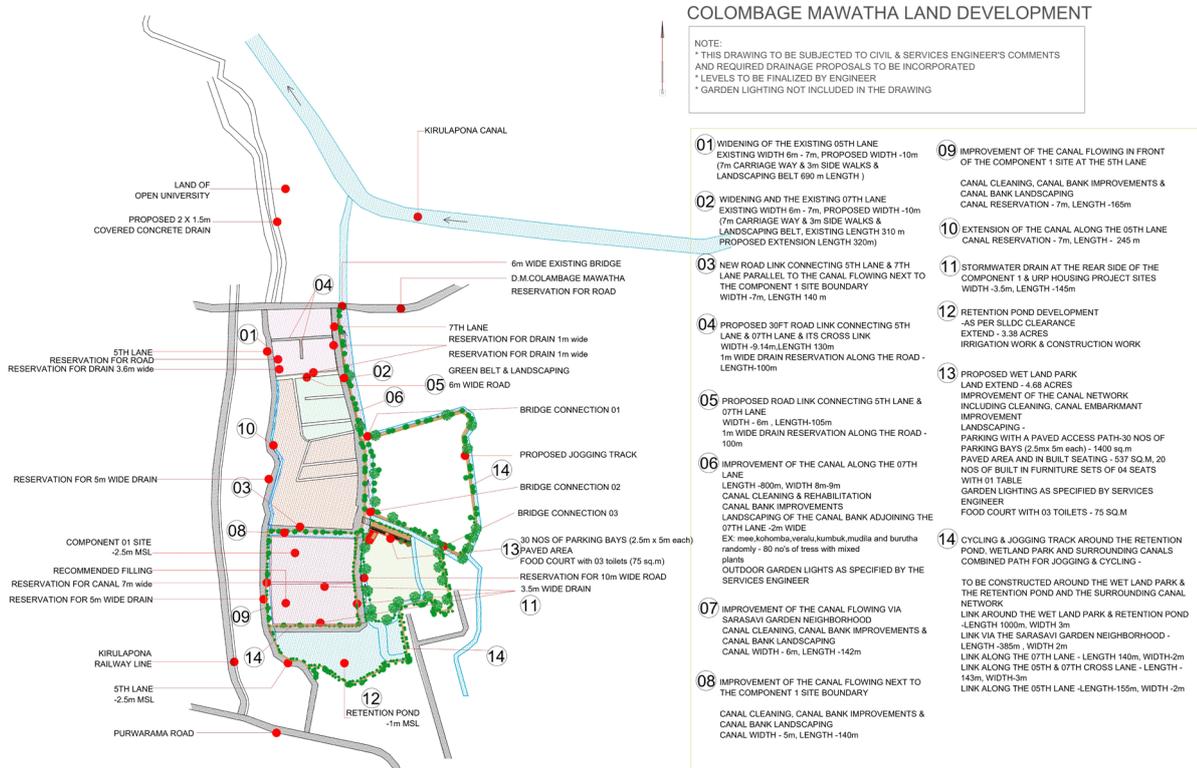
Conceptual Design Plan for Colombage Mawatha Site Development
